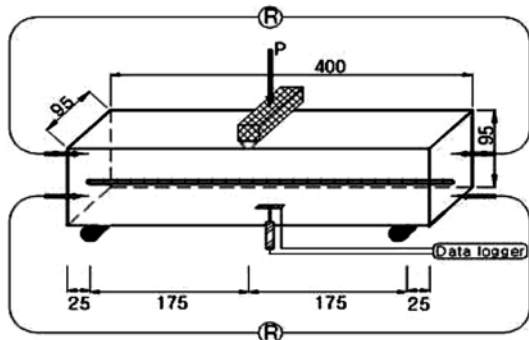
Test specimen and layout of reinforced concrete (RCC and NRCC)
